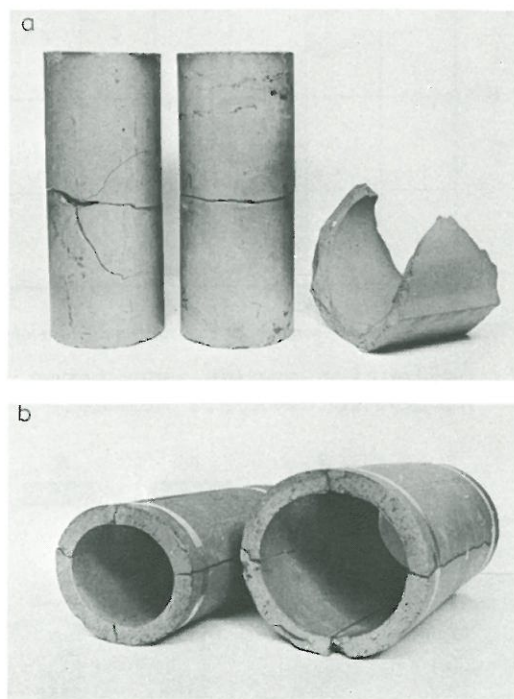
Typical crushing figures. Tyypillisiä murtumia.
